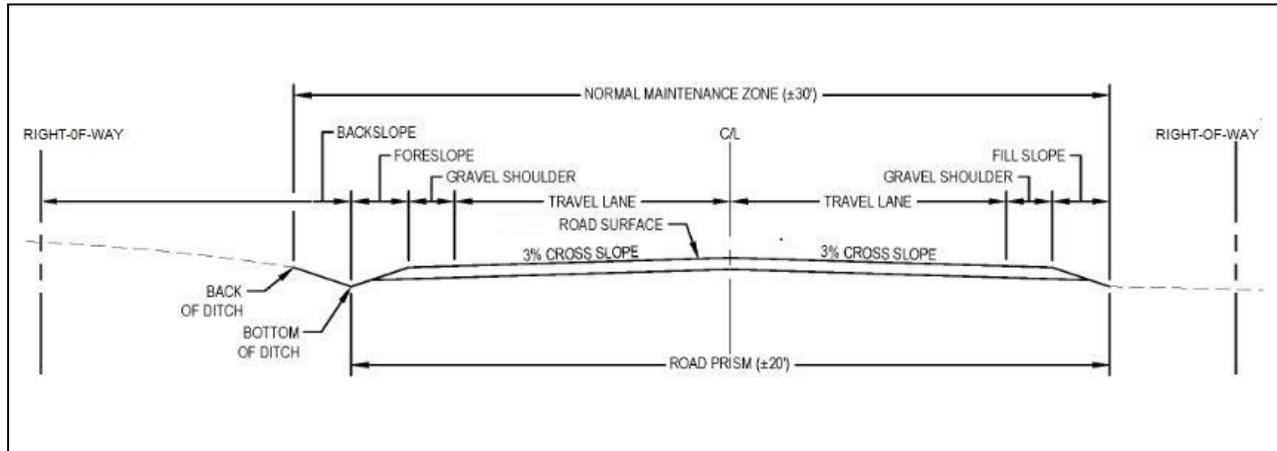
Typical Road Section for Gravel and Paved Surfaces
